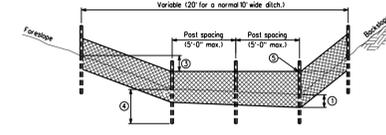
DETAILS OF SILT FENCE ON LONGITUDINAL SLOPES
